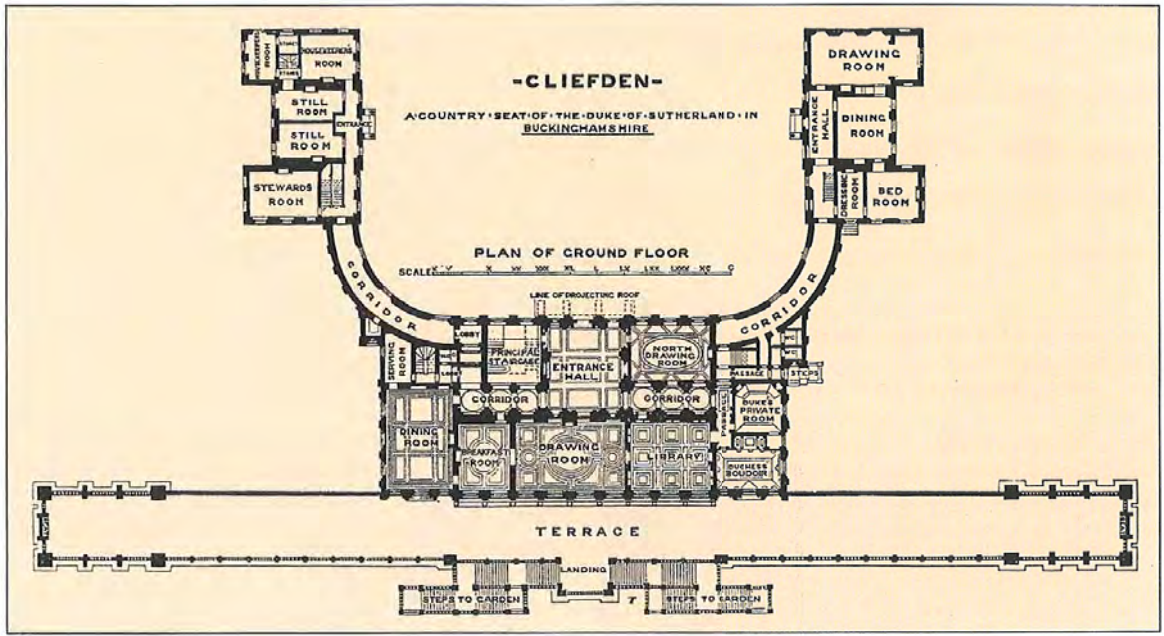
Later 19th century plan, apparently based on Charles Barry's 1850 proposal drawings
